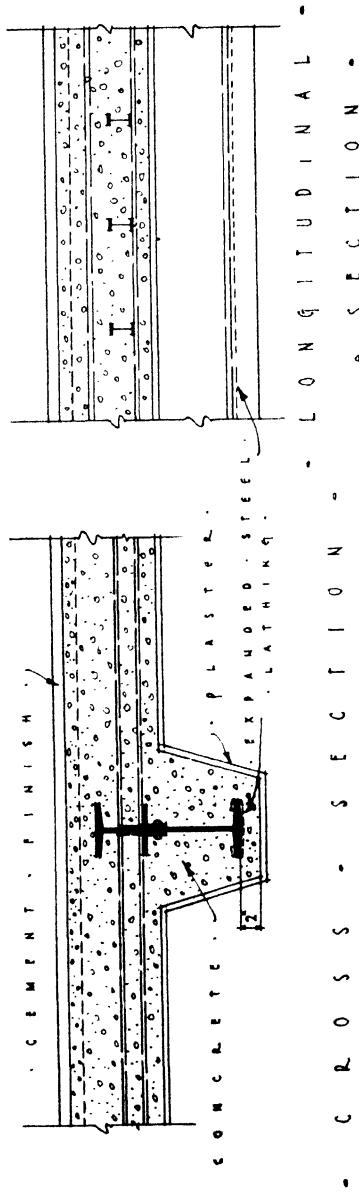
STEEL JOIST AND CONCRETE FLOOR
